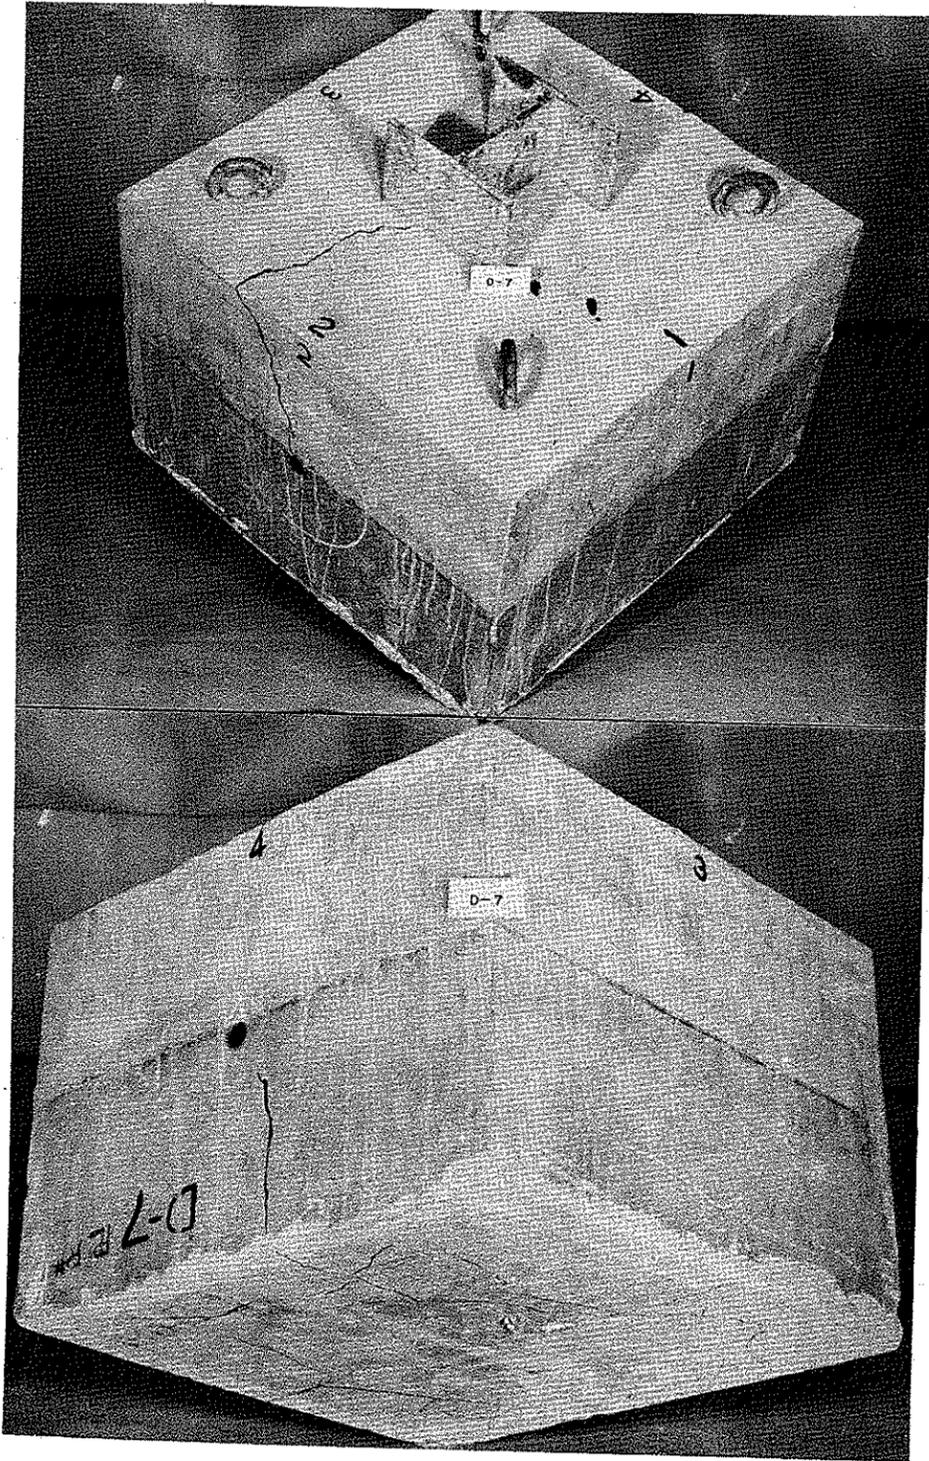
APPEARANCE OF SPECIMEN D-7 AFTER TESTING.
